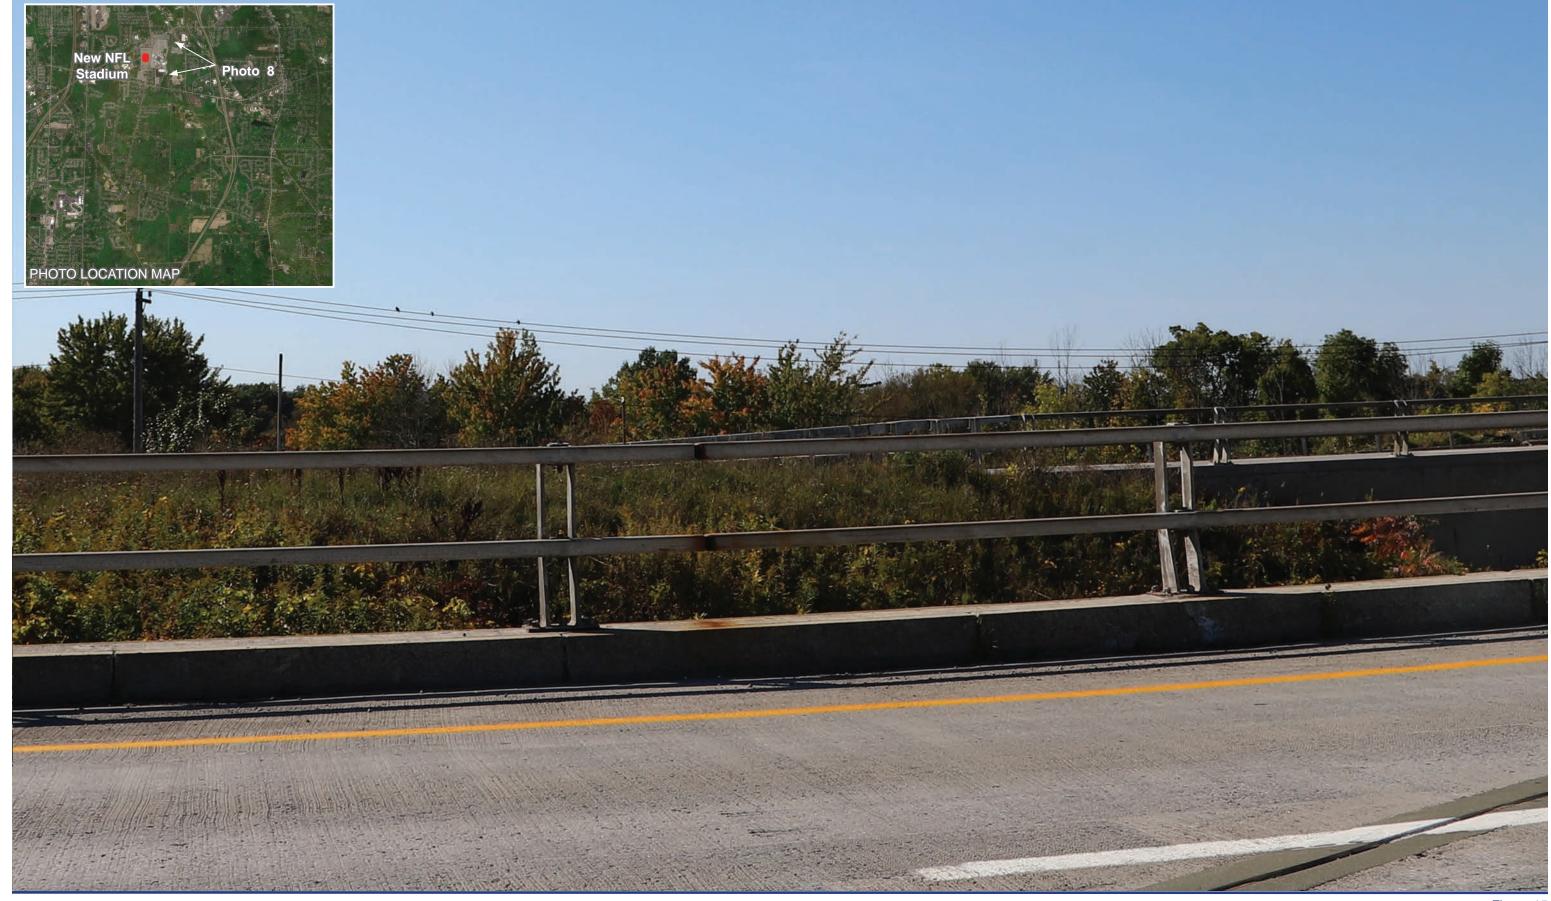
Route 219 Overpass at Taylor Road EXISTING VIEW
